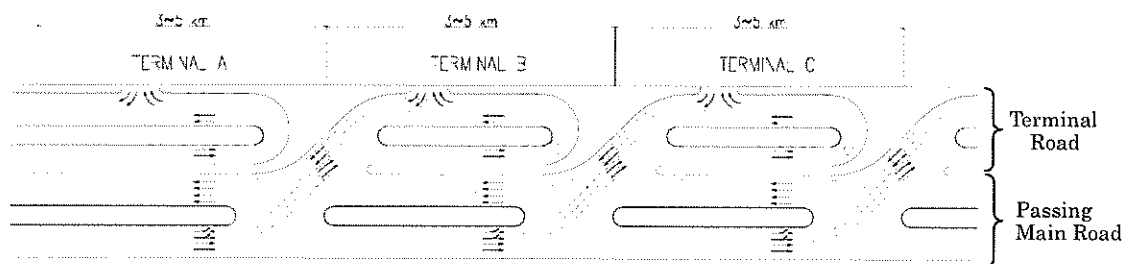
Layout of Each Terminal Road and Passing Main Road (Future)
